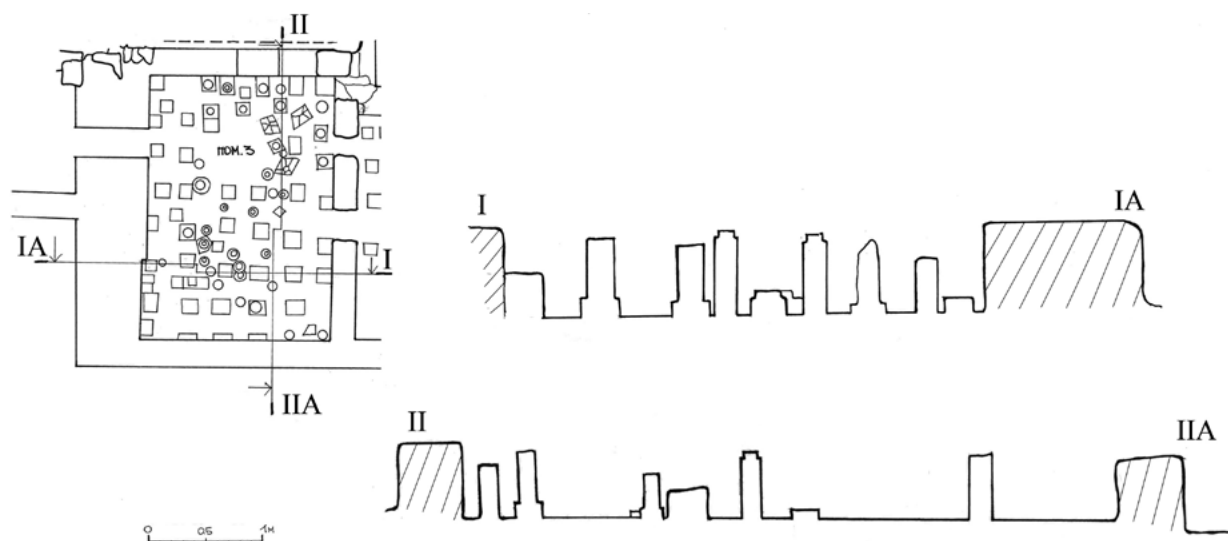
The thermae in the citadel. A floor plan and cross-sections of room no. 3
